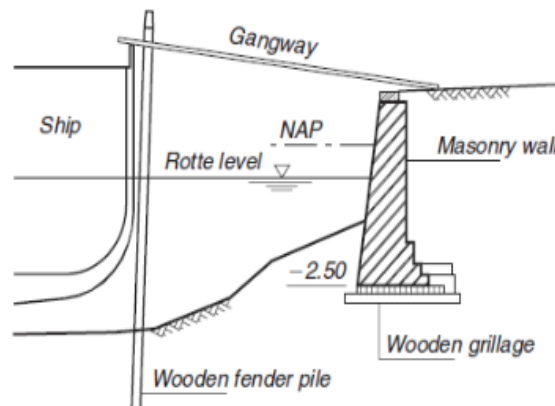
Gravity Quay on shallow foundation (De Gijt & Broeken, 2013)
